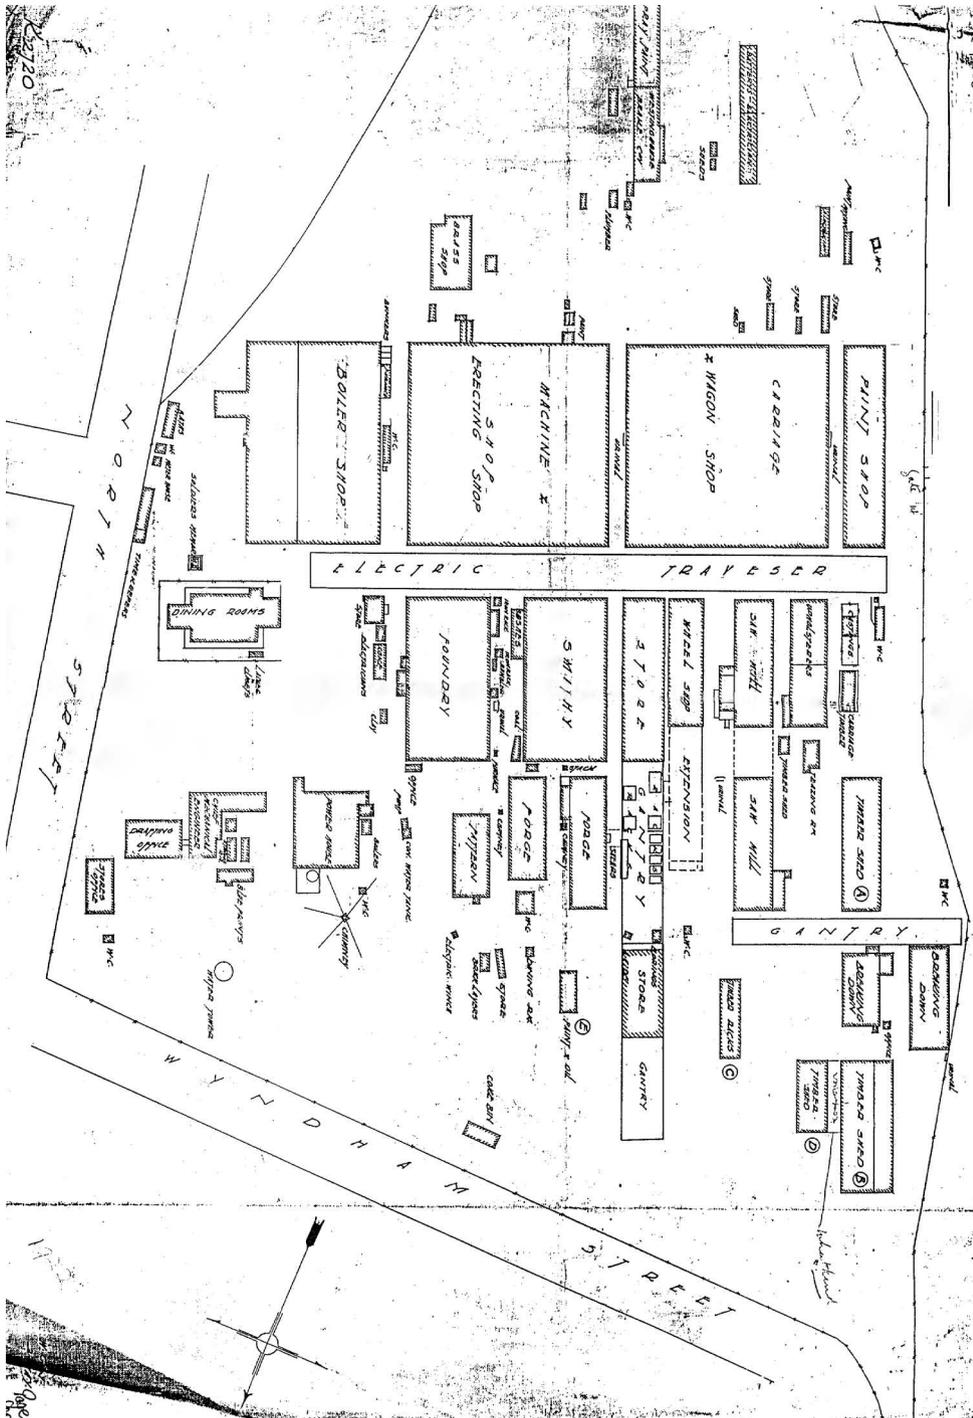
Diagrammatic plan of the Workshops layout on the site, from original plans in 1921. Courtesy of Keith McDonald.
